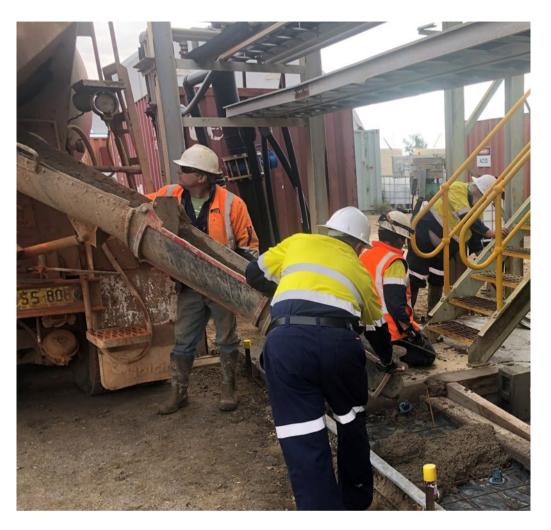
Ground level upgrade to the White Dam process plant, using Bindarrah Station owned cement mixing truck.
